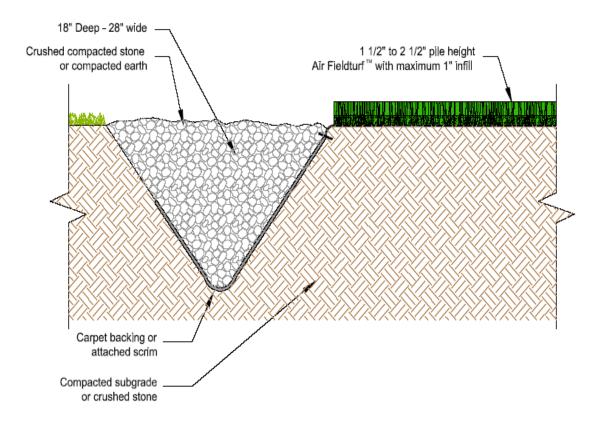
AIR FIELDTURF CROSS-SECTIONAL VIEW OF A U-SHAPED TRENCH INSTALLATION
